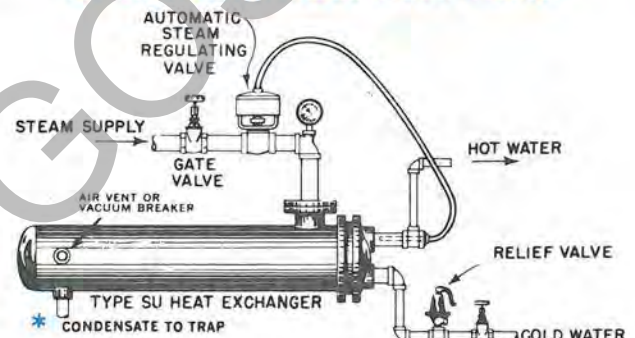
Typical installation of "SU" Heat Exchanger when used as an Instantaneous Heater.
